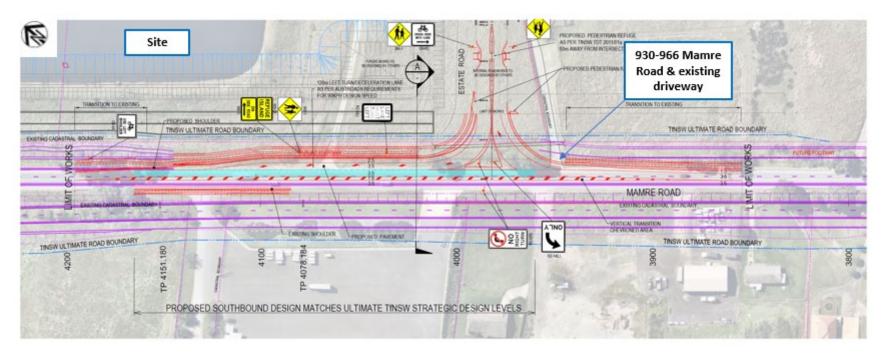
Stage 1 of the Left-In/Left-Out Intersection at Mamre Road
